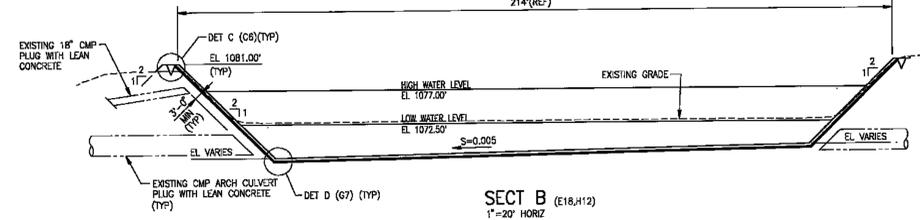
(Cooling Tower Desilting Basin)
